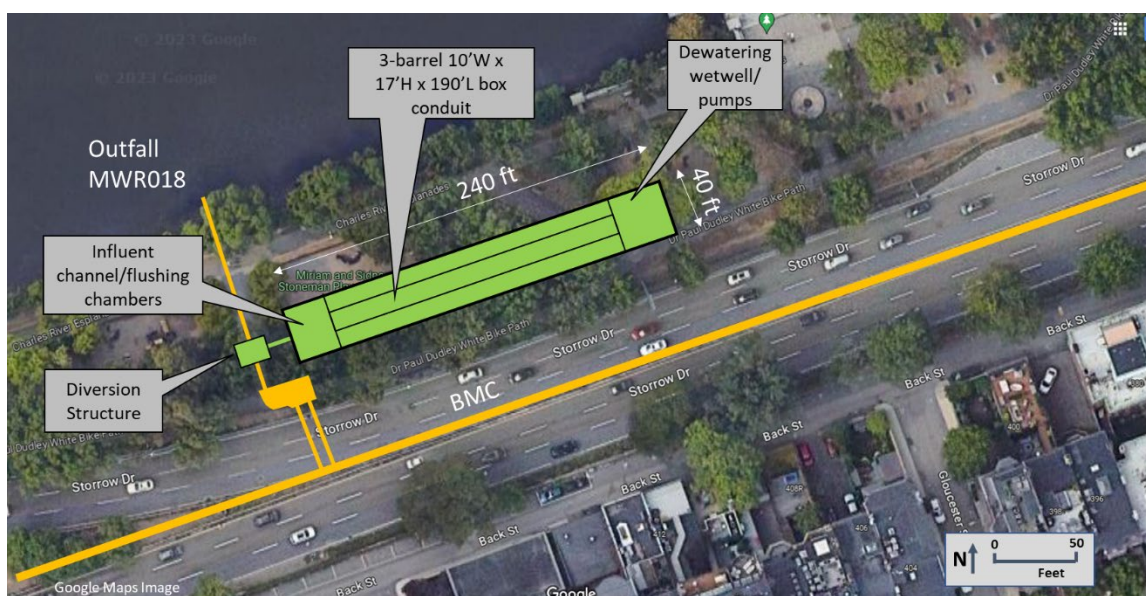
Box Conduit Storage Layout at Outfall MWR018
